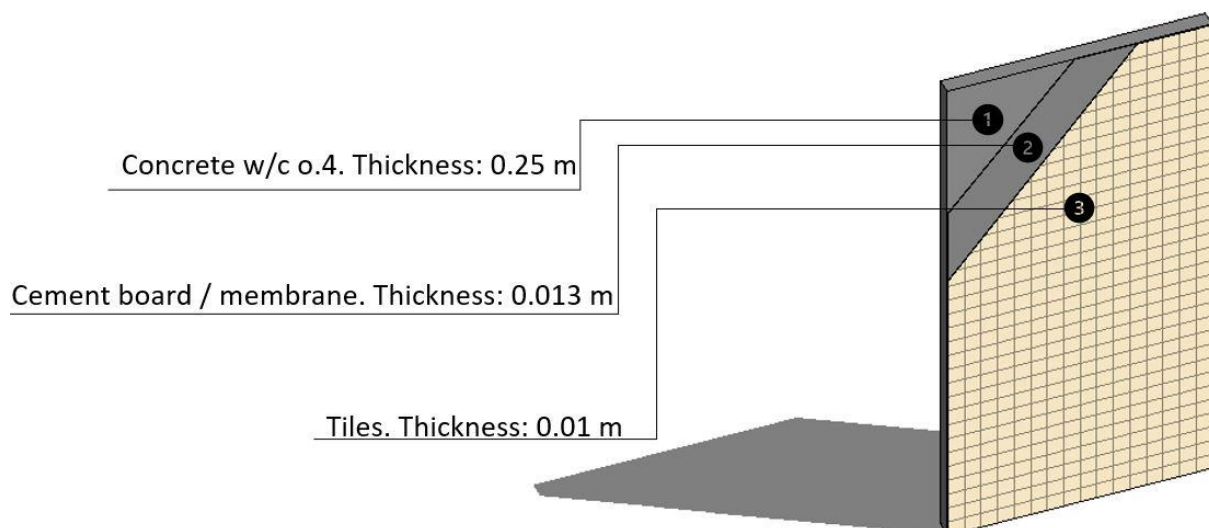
Bathroom concrete wall towards the next apartment based on Byggforsk 543.506
